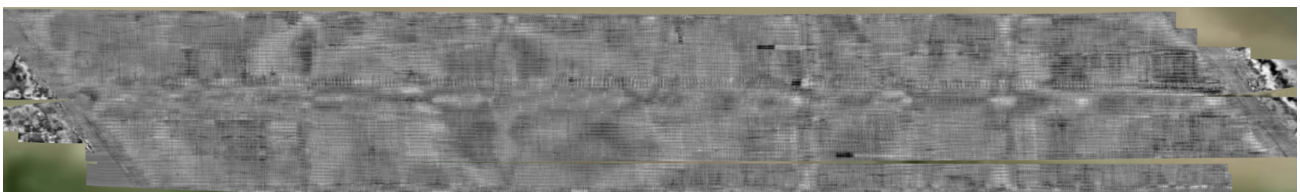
GPR Image Showing Bellow Top Steel Condition of Bridge Deck No. 22451
